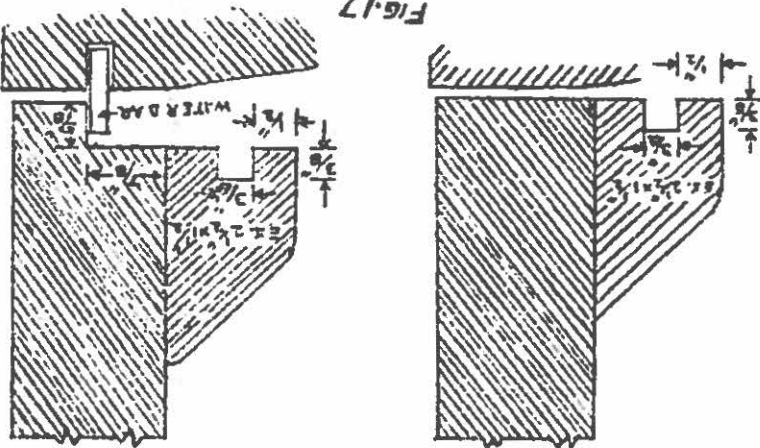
TYPICAL POSITION WHERE DOOR NOT REBATED WEATHER MOULDING TO EXTERIOR DOORS.
